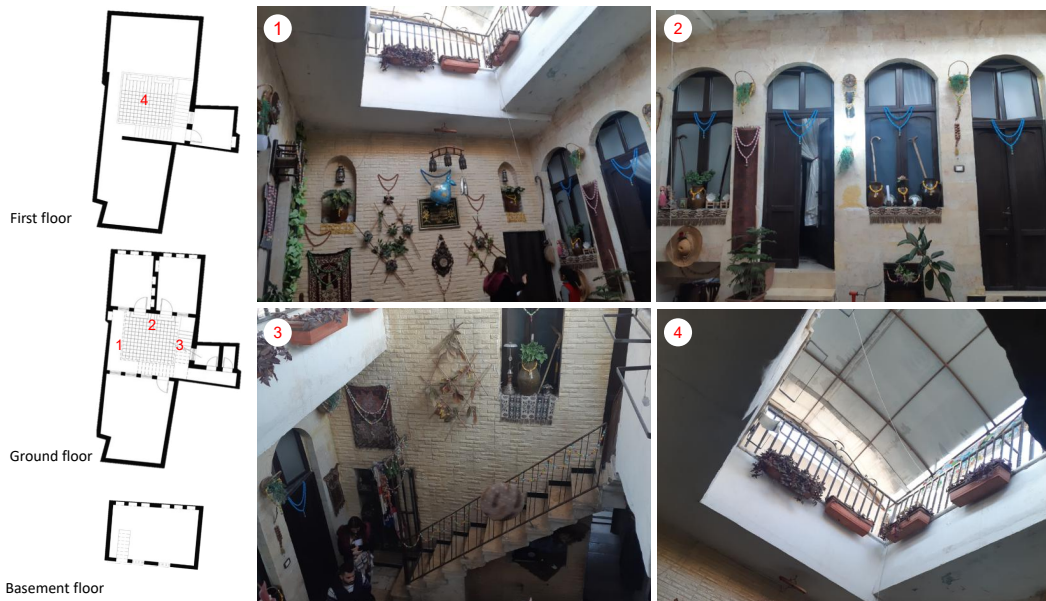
The documentation for the traditional courtyard house (Type 2), cadastral number 1450, located in the Al-Aqaba neighbourhood, includes an AutoCAD-drawn plan and photographs of the interior façade. The house has been modernised by returnees; Photo (4) illustrates the covering of the inner courtyard.
